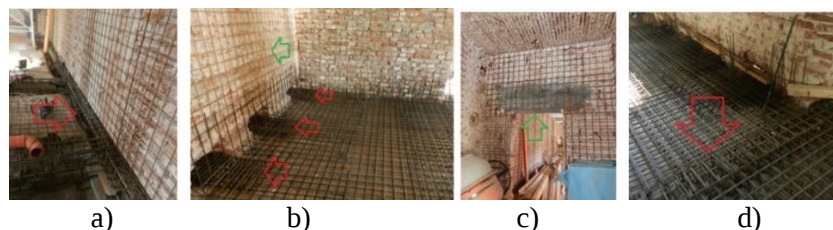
a) reinforced concrete belt / bearing type element, provided for ensuring the embedding of the reinforced concrete jacket; b) the new reinforced concrete slabs will be supported in the “teeth” system; c) at the level of the gaps, new reinforced concrete buinadrugi must be provided; d) reinforced concrete belt housing, provided for the masonry load-bearing wall, from the lower floor (ground floor)
